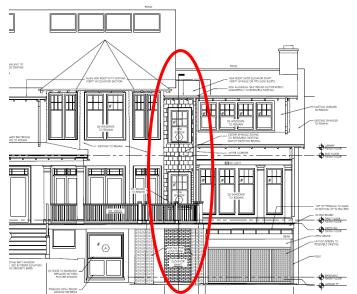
Partial rear elevation showing the proposed elevator tower (circled).
